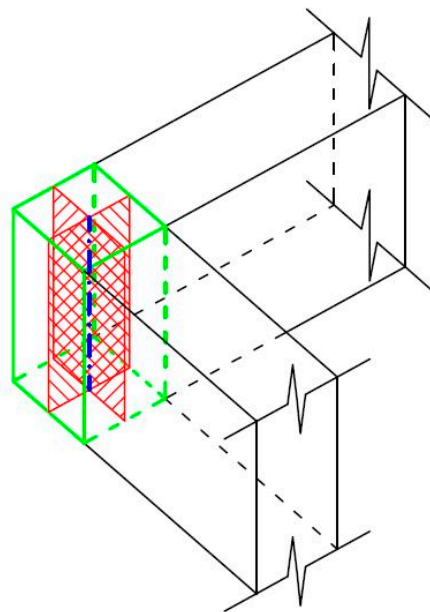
Parallelepiped constituting the intersection between two adjacent beams in the floor cell model made by solid finite elements.
